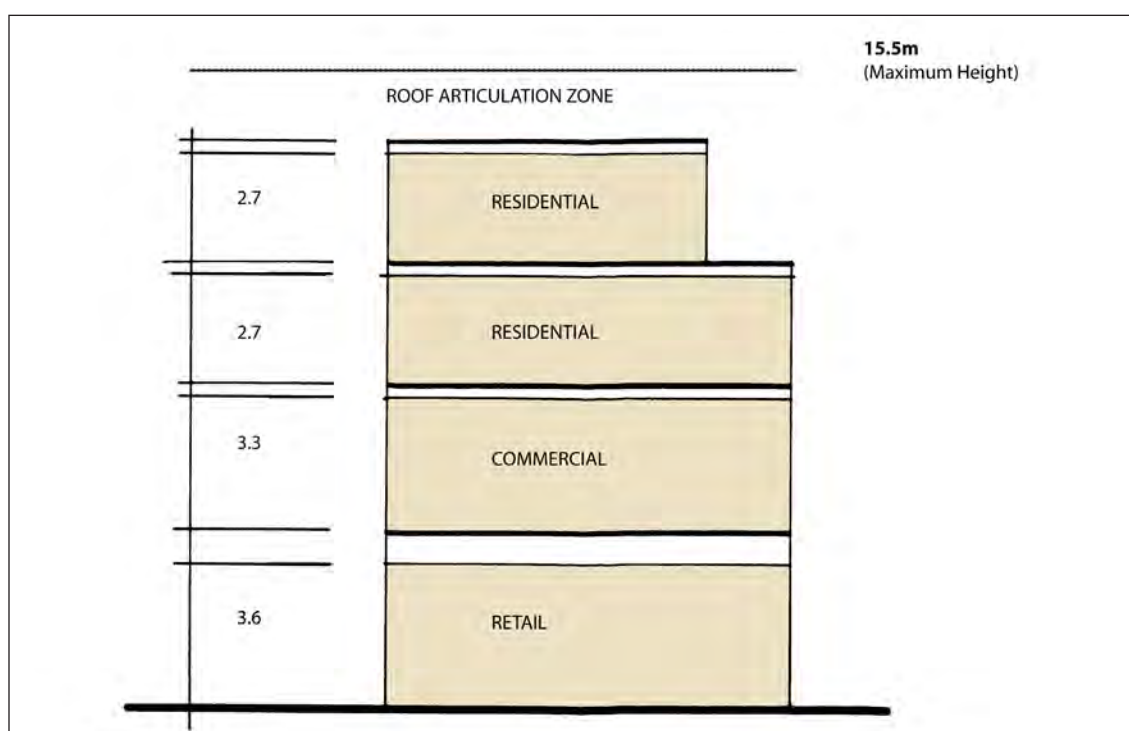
Minimum Floor to Ceiling Heights (Indicative)
